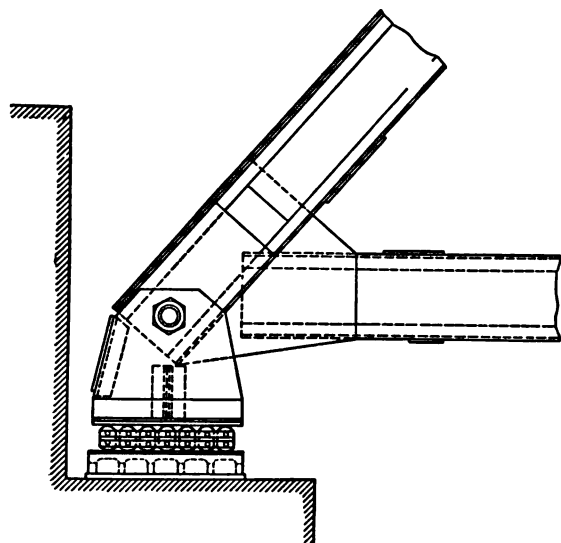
Typical Bridge-truss Shoe with Rollers.
